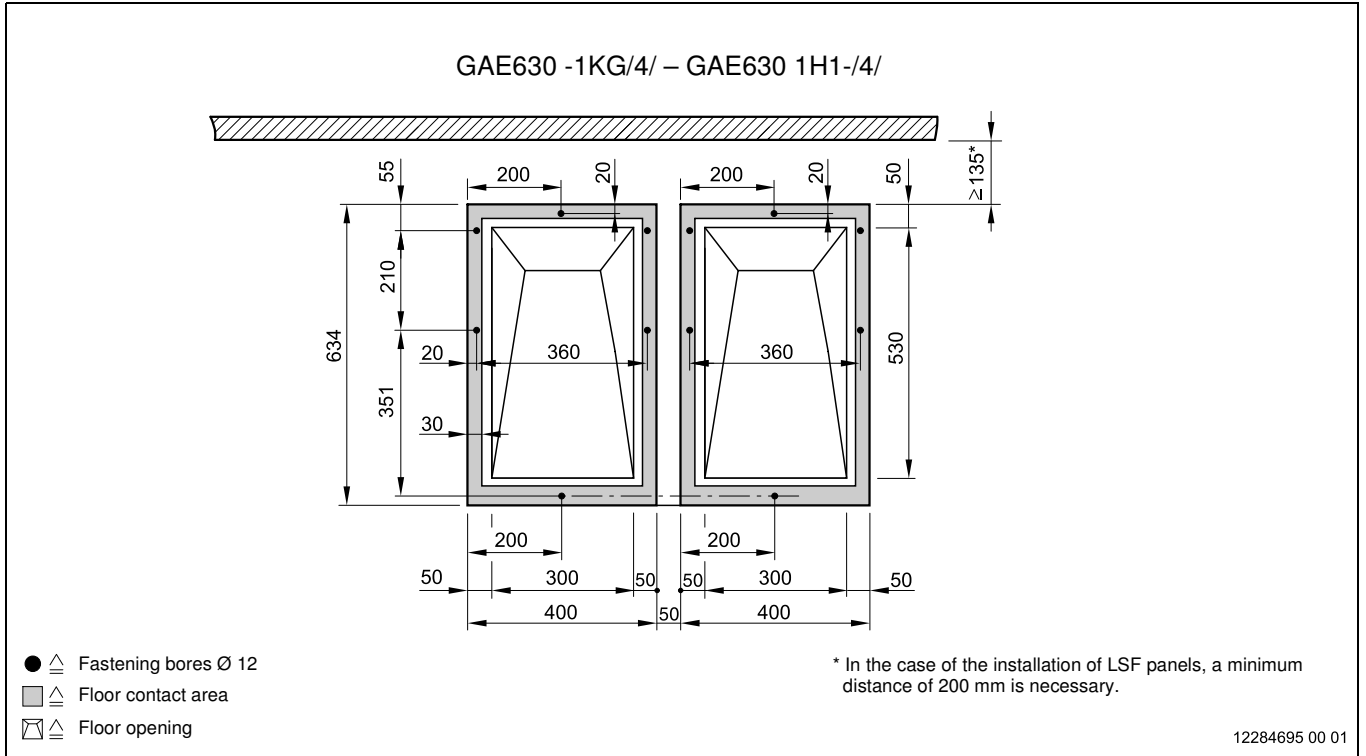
Floor fastening measurements (all dimensions are nominal dimensions [mm])
